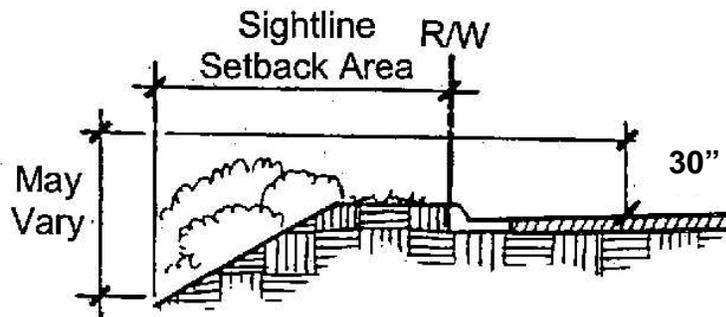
SIGHTLINE SETBACK CROSS SECTION
